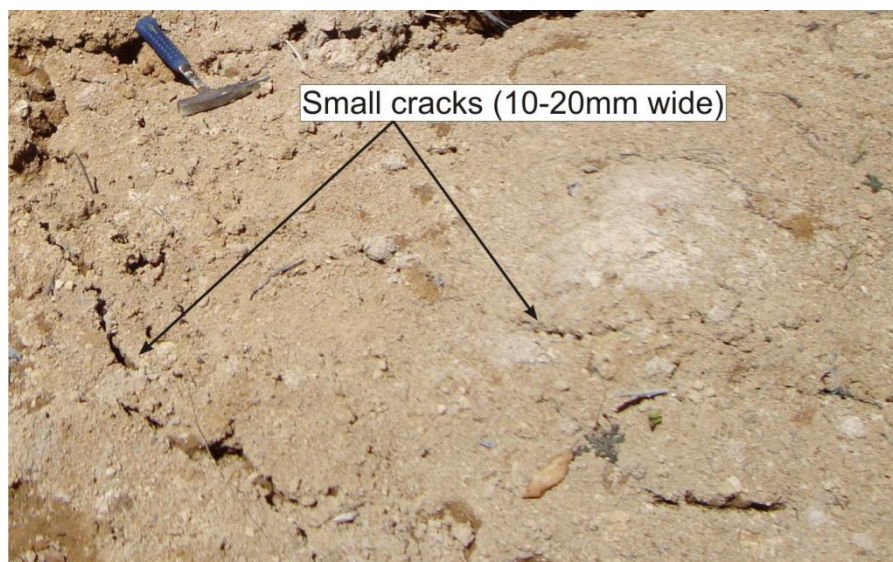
Small cracks identified within sandy silt material at the head of the wedge indicating recent movement.
